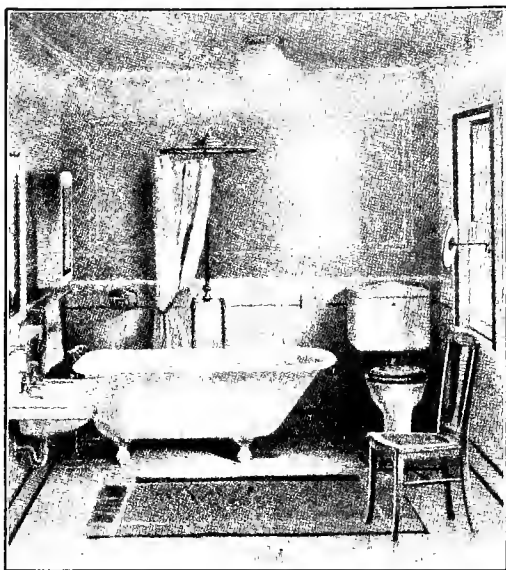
A well-fitted bathroom, the fixtures sanitary and simple.
